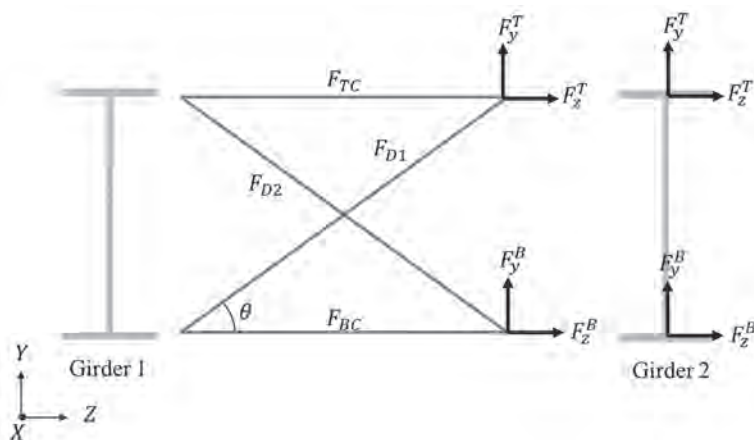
Fit-up forces by resolving cross-frame forces at connection points.
